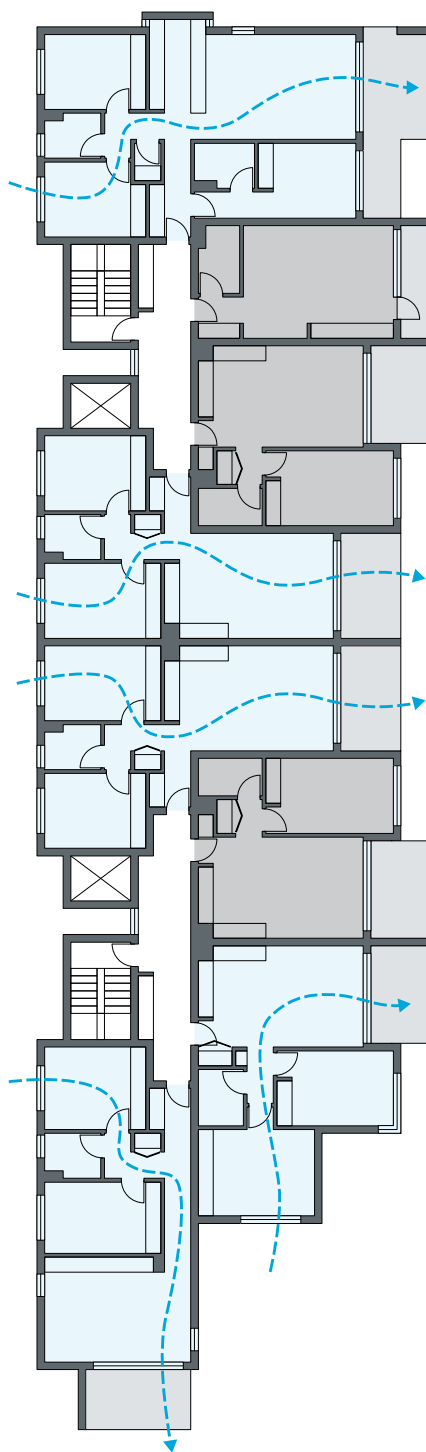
Q.10 The floor plan above demonstrates how five of total eight apartments achieve natural cross ventilation
